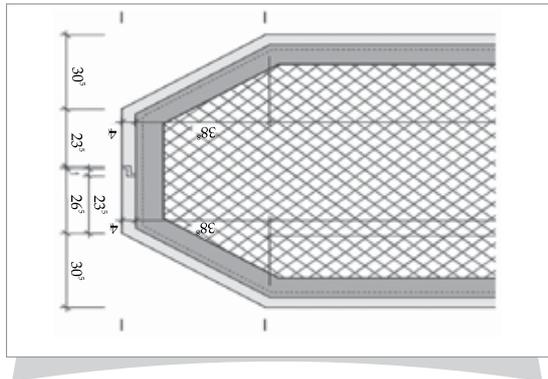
Rehabilitation of bridge pier using precast UHPFRC shell elements.
